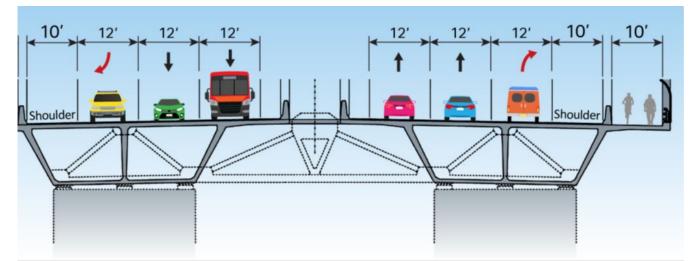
shows the MRER/EA's Preferred Alternative concept for the replacement bridges.
